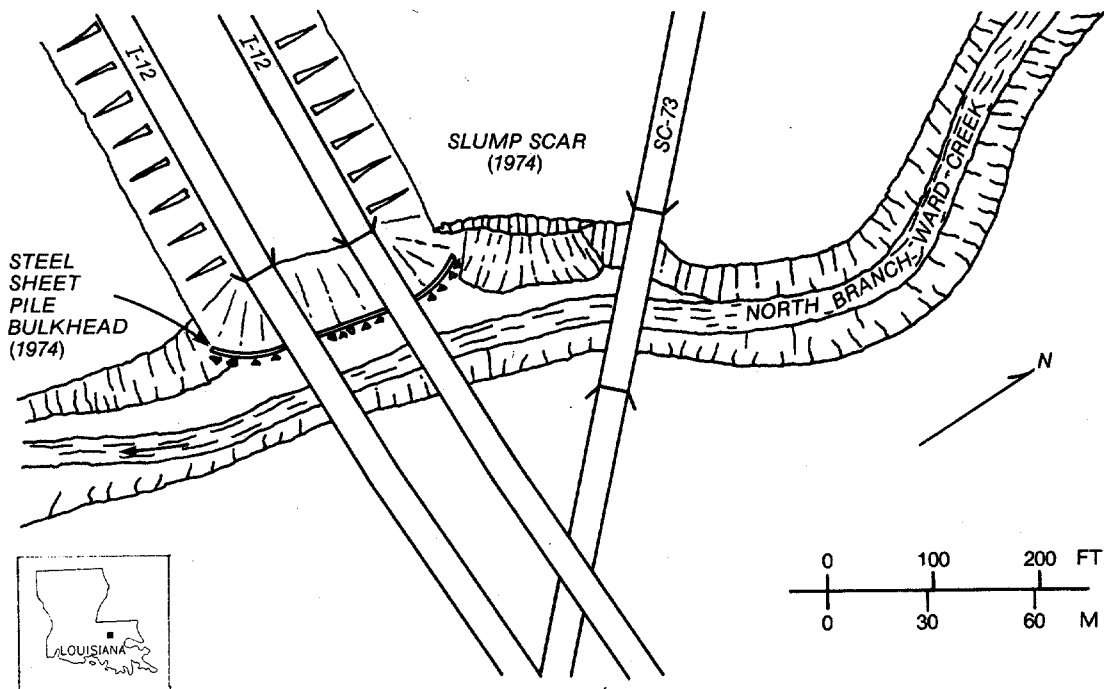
Plan sketch of North Branch Ward Creek at I-12. (From aerial photograph taken February 1974.)
